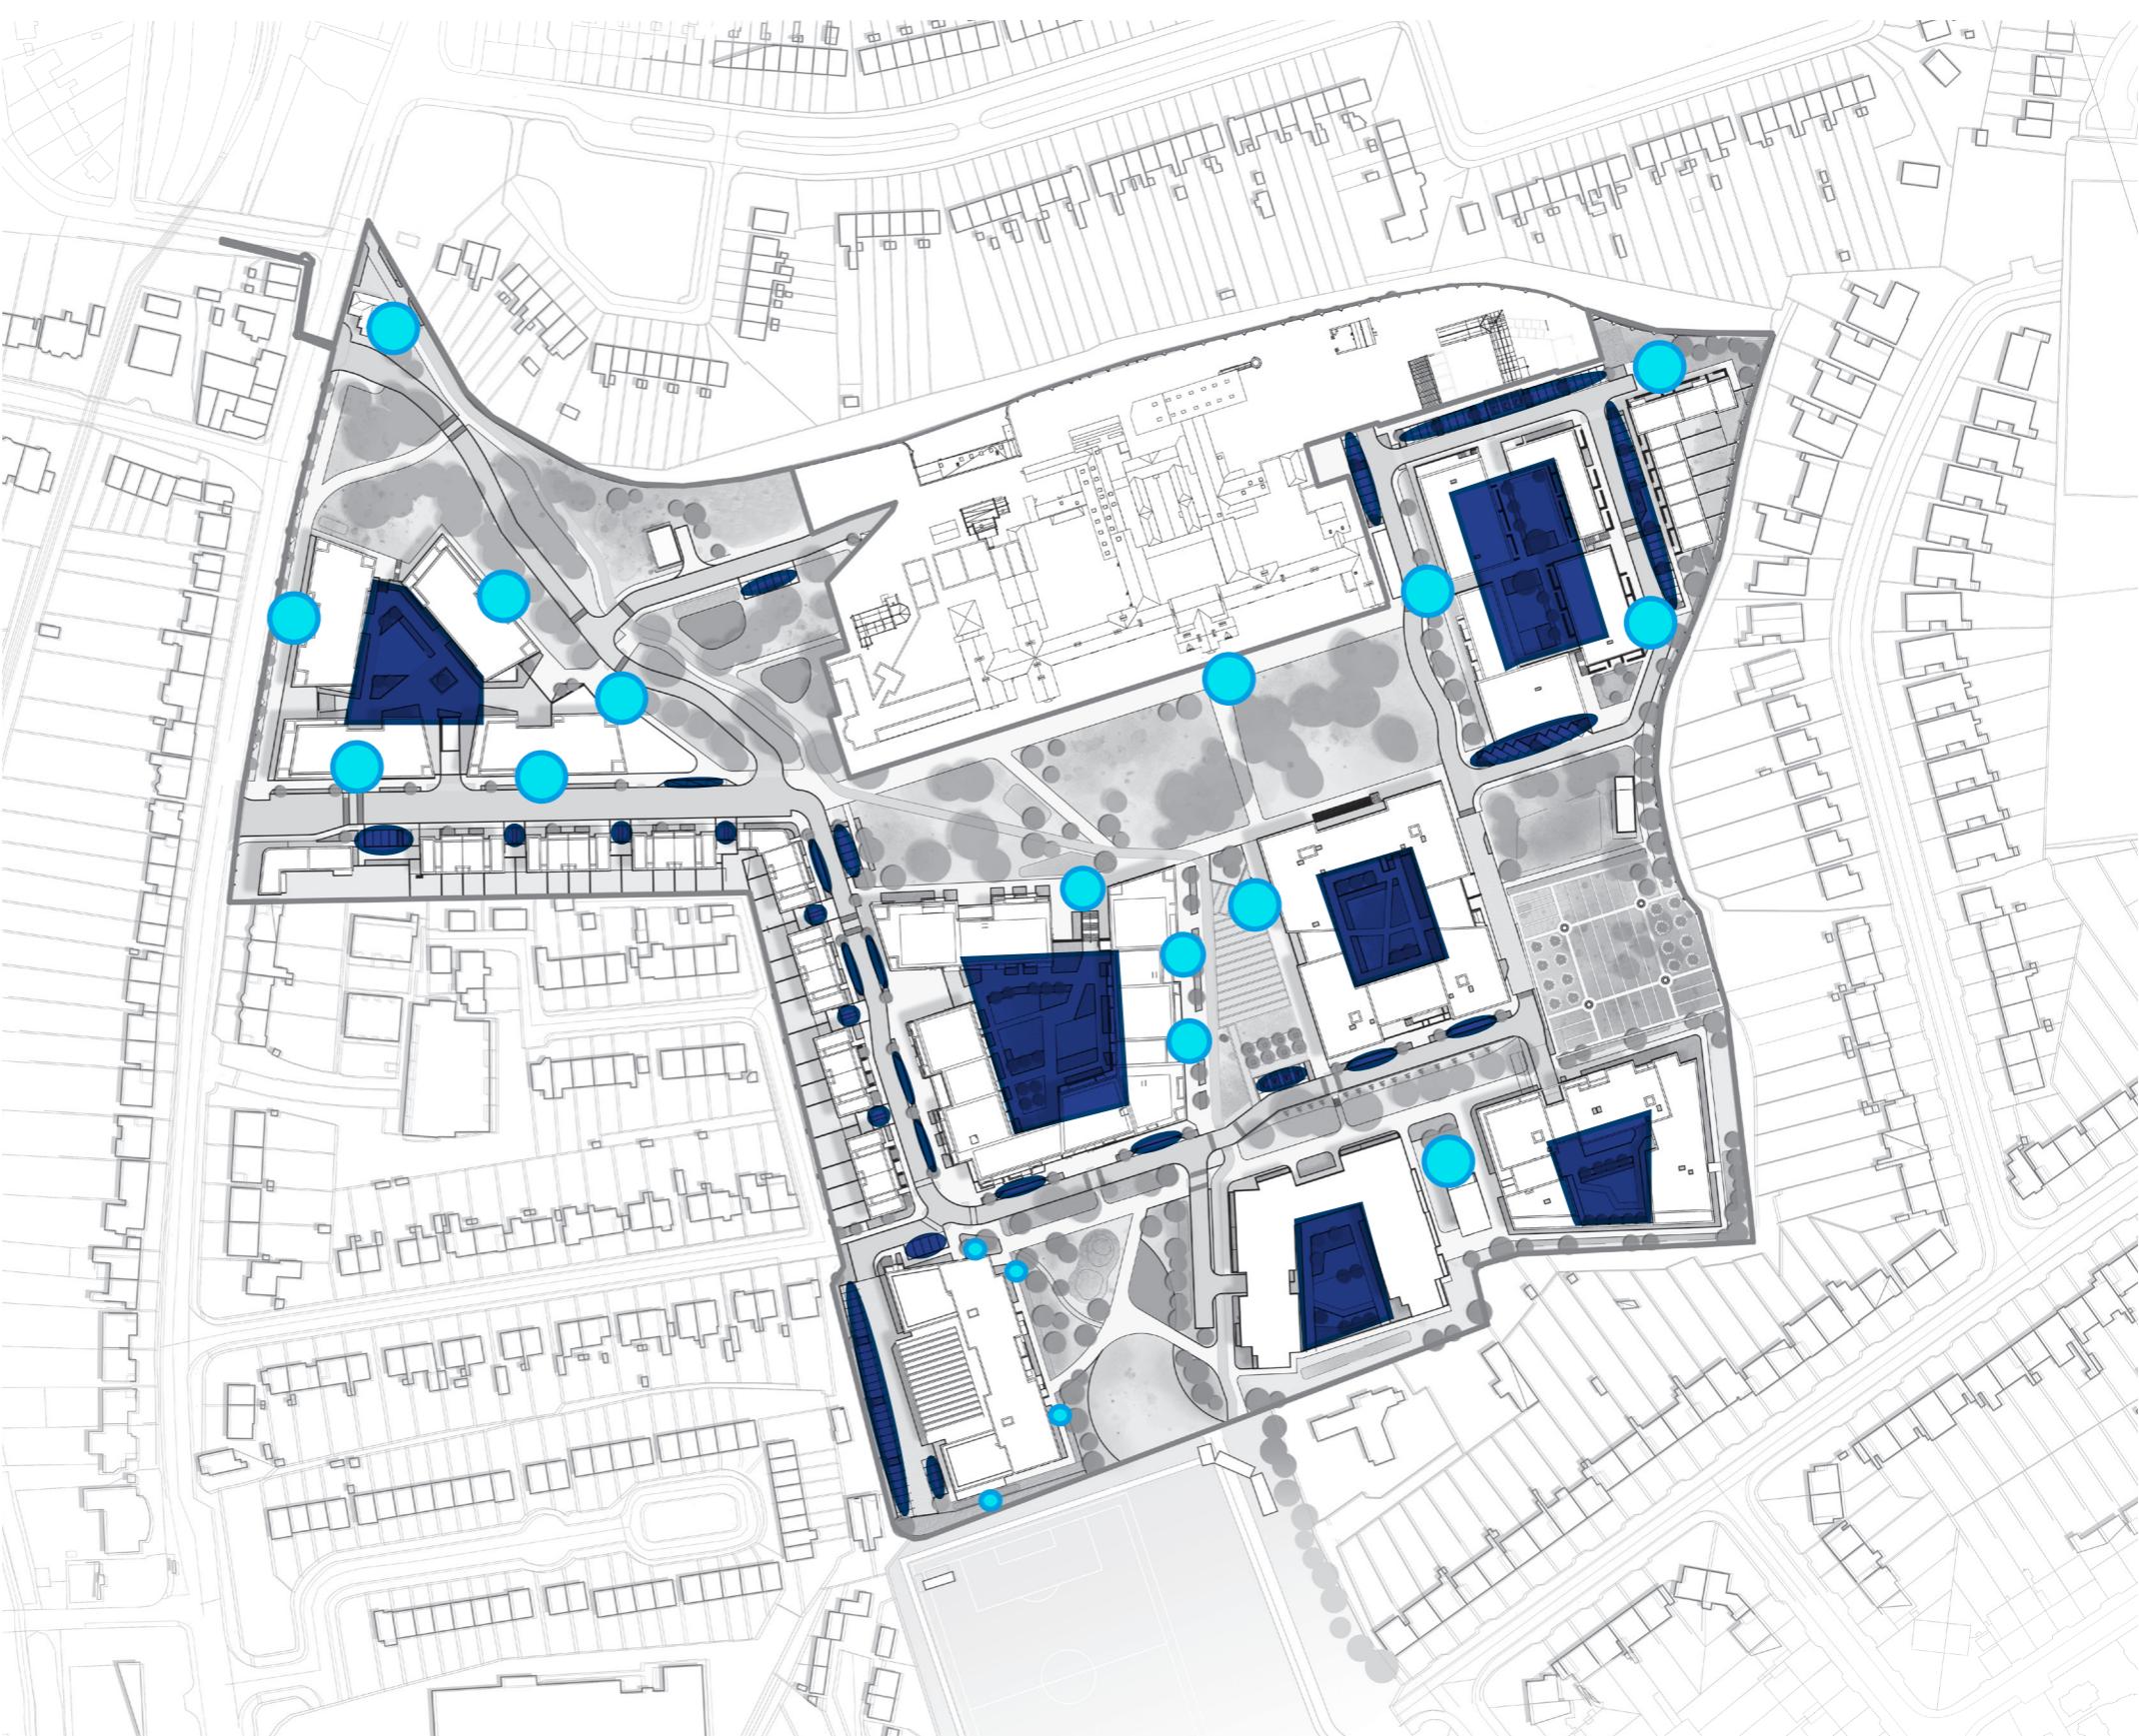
Site plan highlighting vehicle (dark blue) and on-site bicycle (light blue) parking. Each apartment block has both vehicle and bicycle parking facilities.
